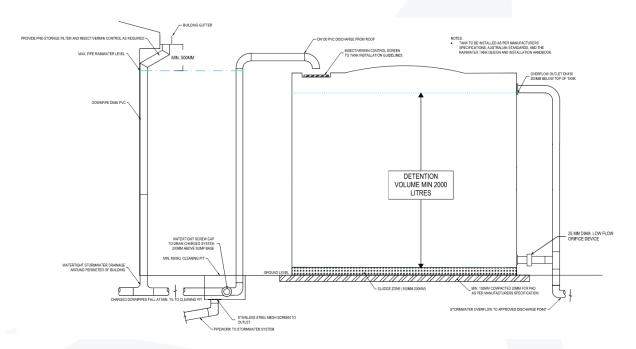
ABOVE GROUND DETENTION TANK DETAIL.
